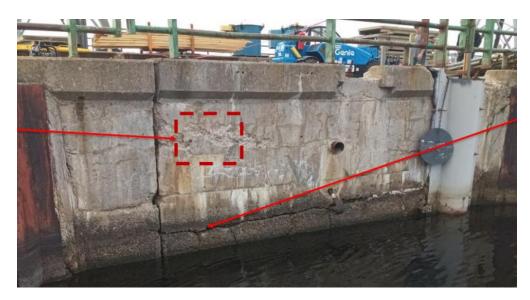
Example of concrete repairs required at the upstream face of the water intake structure
